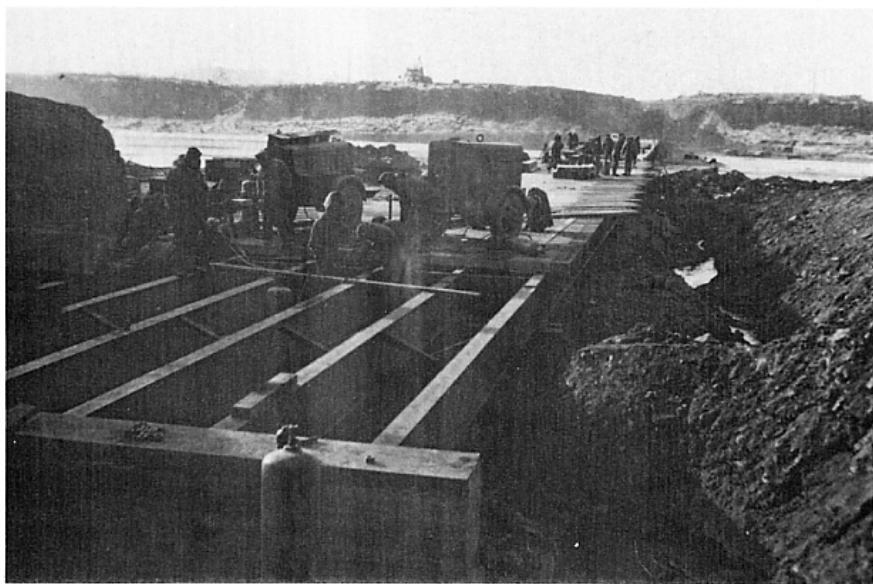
Girders in place on piers 8 through 11 allowing the passage of water below these spans and the construction of a causeway to pier 11 from the north bank.
